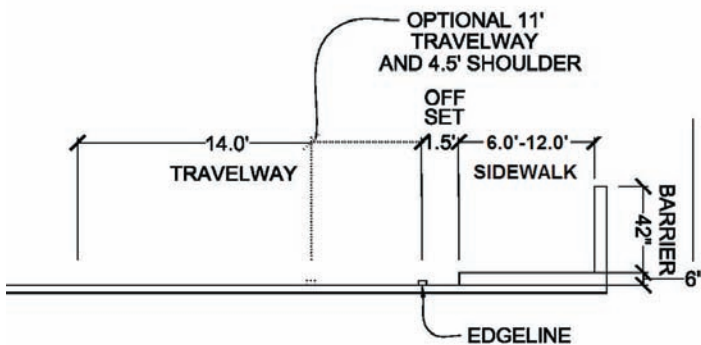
Bridge Cross-Section (curb section) for roadway not designated as a bike route. The edgeline can be striped to provide either a 14-foot travelway with a 1.5 foot shoulder or an 11-foot travelway with a 4.5 foot shoulder. Note: Not to scale.
